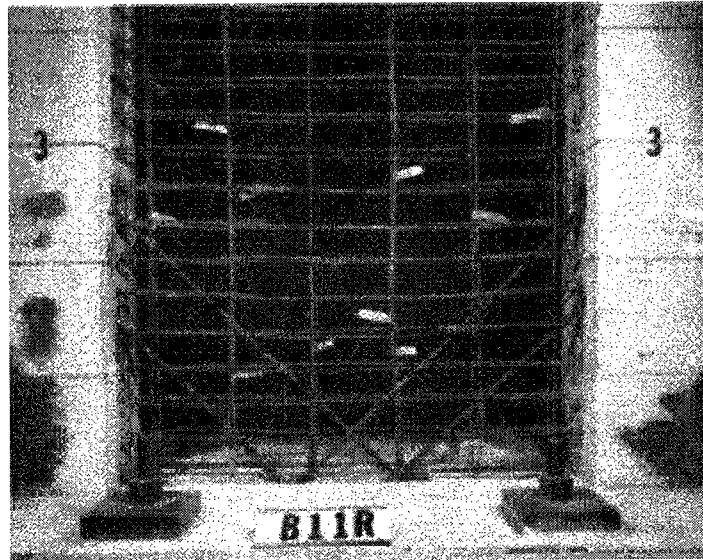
Diagonal Reinforcement of Repaired and Retrofitted Shear Wall B11R (Fiorato et al., 1983)
